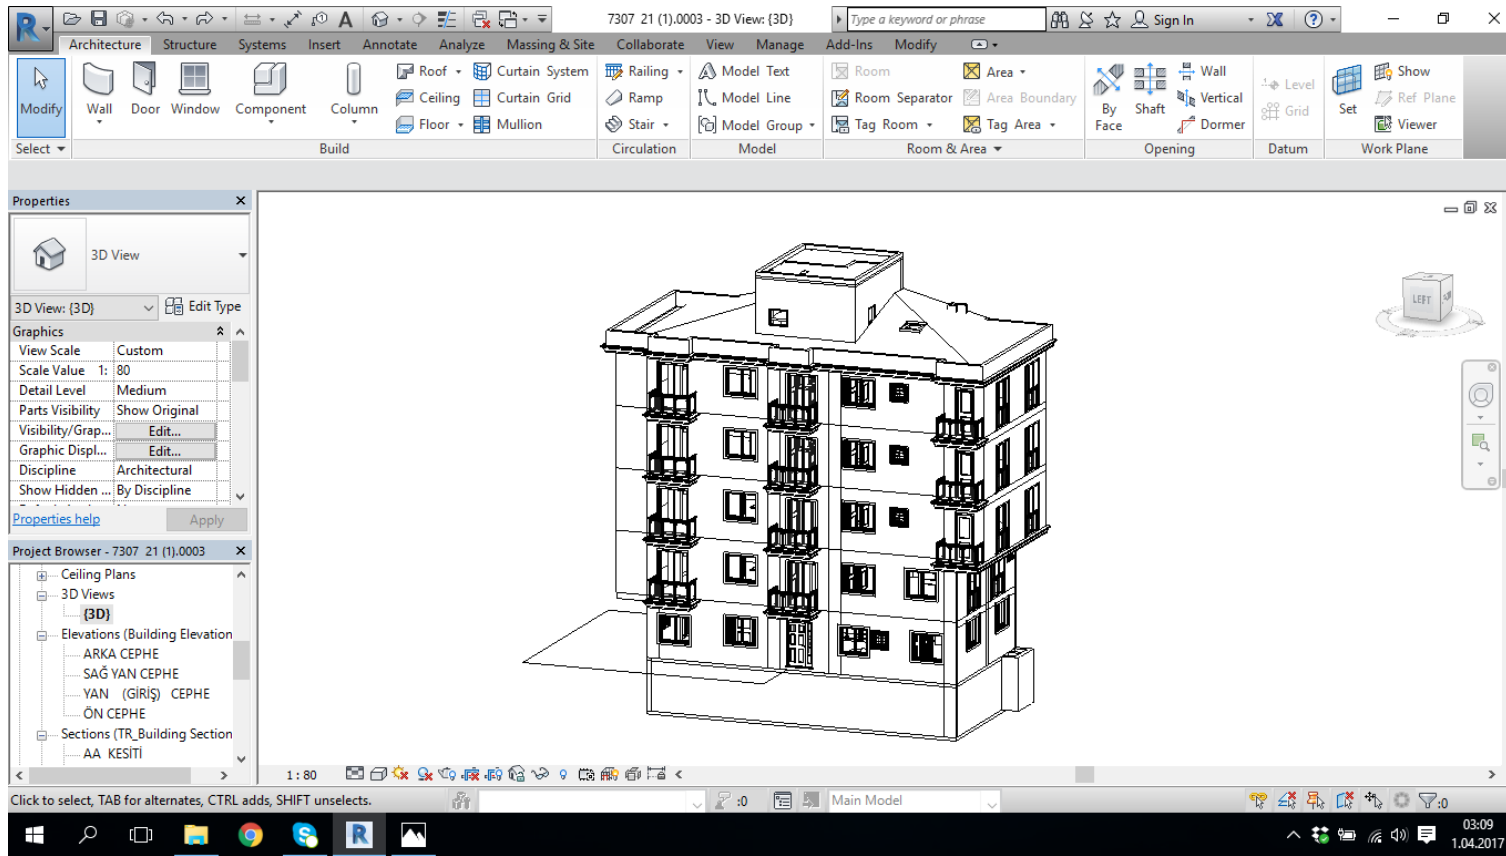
3D model of multi-storey reinforced concrete building project selected as reference on Revit Architecture
